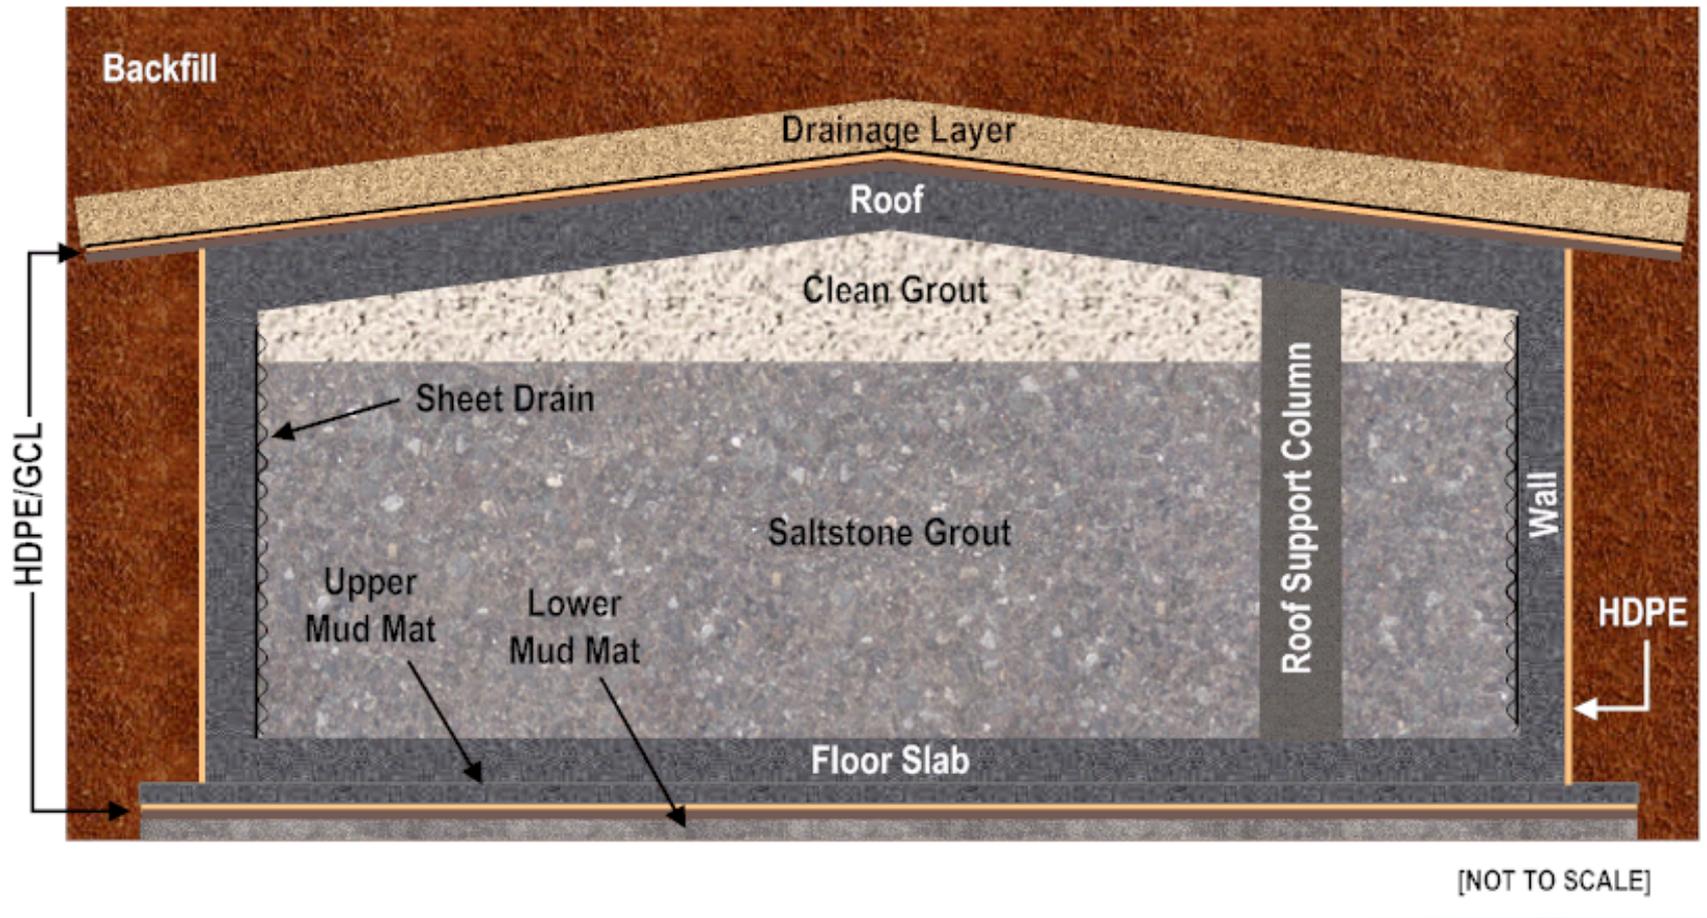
Sketch of Typical Type IIIA Tank (Cross-sectional View)
